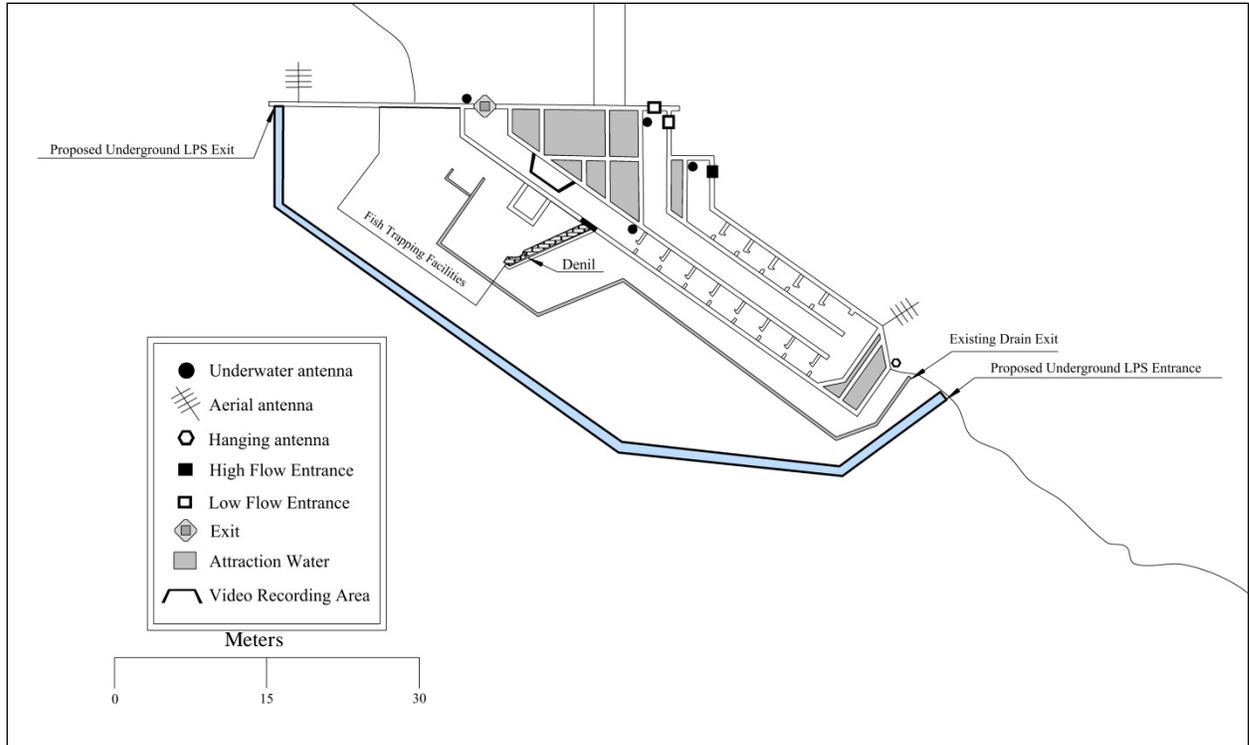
Proposed site and concept for an underground LPS on the right bank of Prosser Dam.
